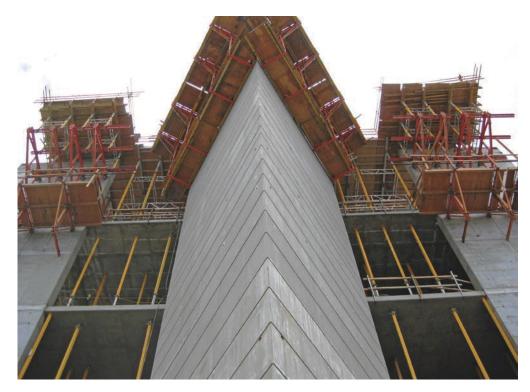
Tight form joint intersections produce well-defined edges (Photo courtesy Morley Builders)
